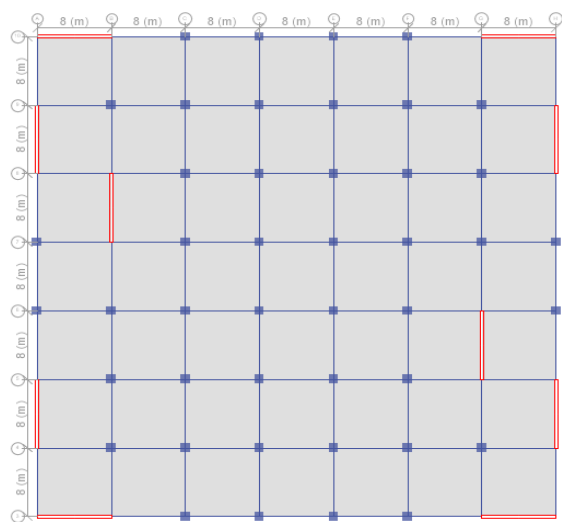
Model 3: Shear Wall with Staggered Openings (3mx1.4m): Plan
